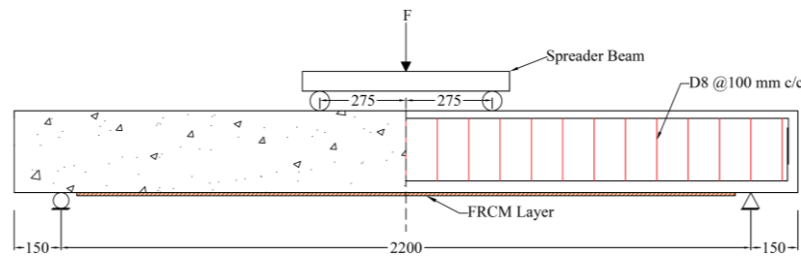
Dimensions and reinforcement details of the longitudinal section of the beams.
